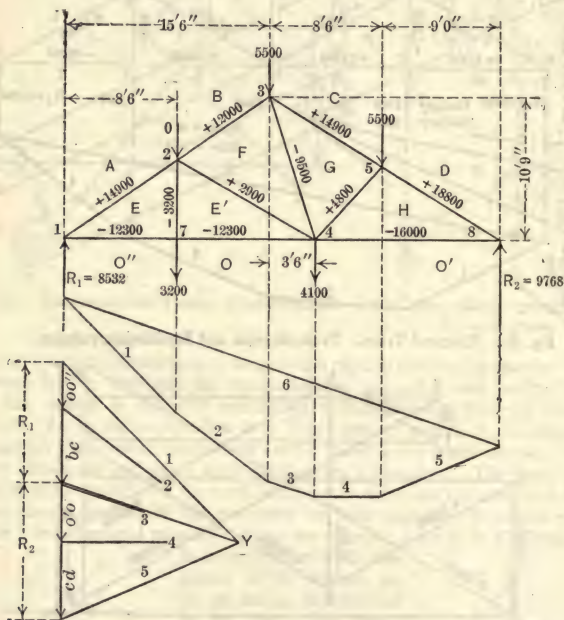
Unsymmetrical Truss. Truss-diagram and Equilibrium-polygon
